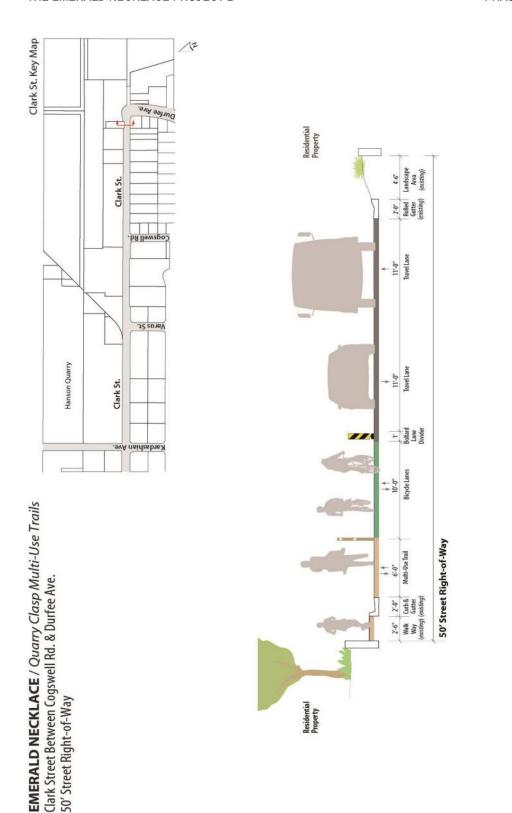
Cross section of trails at the narrowest section of the Clark St. right-of-way.
